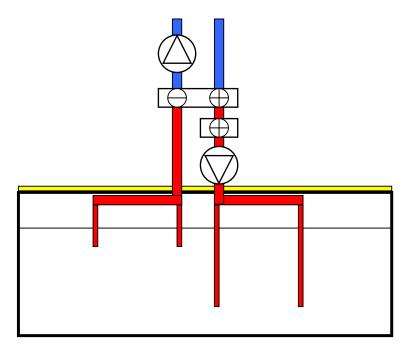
Low-rise building with heat recovery and new roof cover after renovation.
